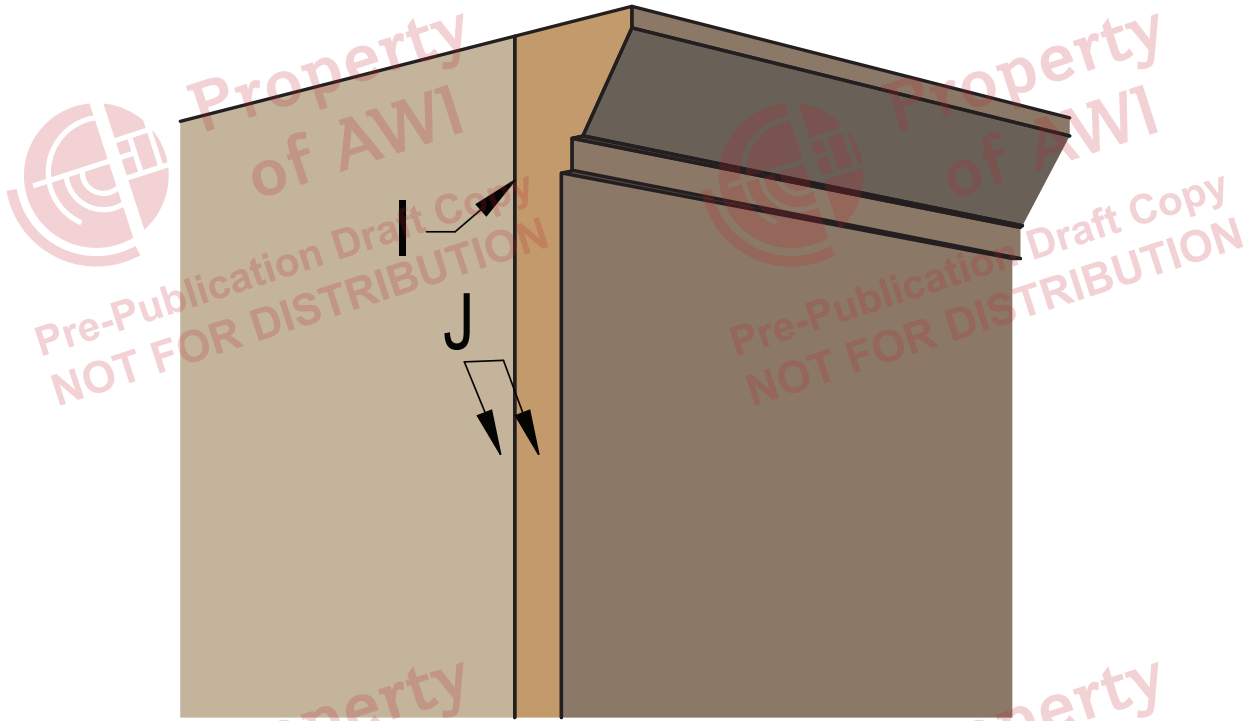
Gaps and Flushness, Wall and Ceiling Surfaces
